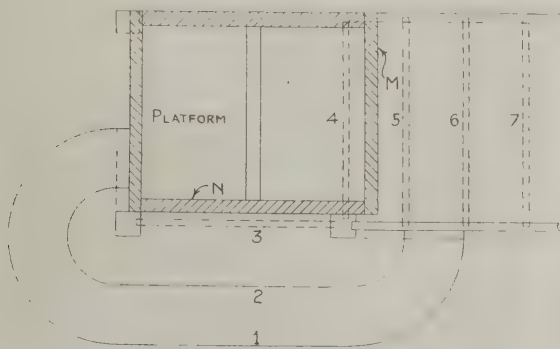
Plan Showing How to Frame the Platform—Scale $\frac{3}{8}$ In. to the Foot
